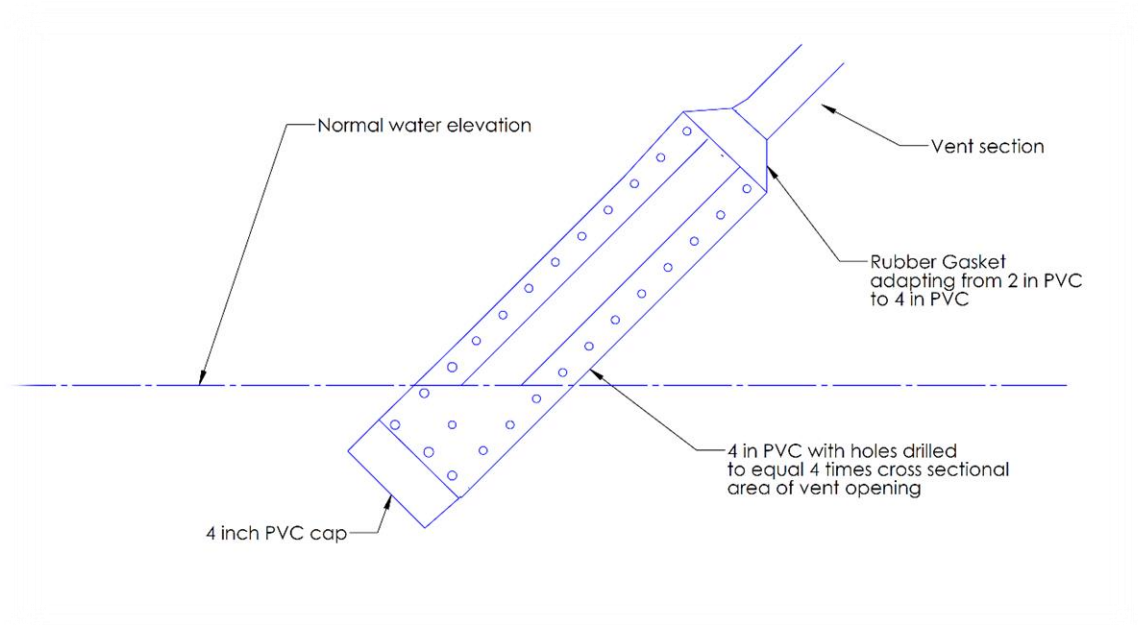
Vent Guard Figure. Shows the concept of a vent guard. Should be considered for testing in future field studies.
